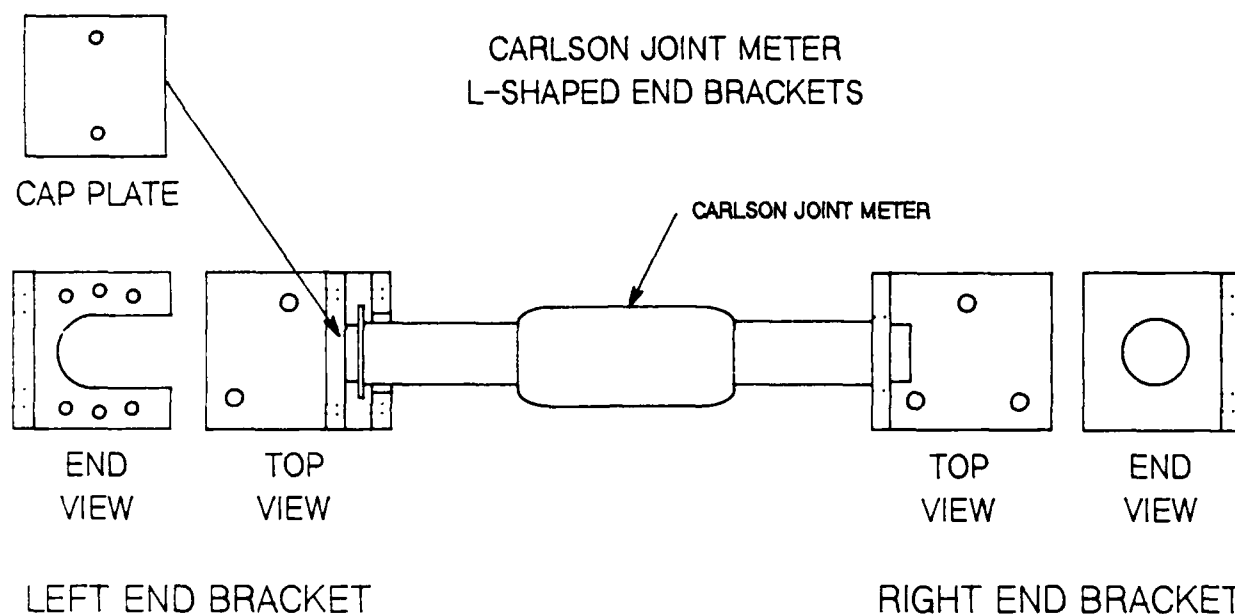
Sketch of L-shaped brackets used to secure Carlson meters to wall
